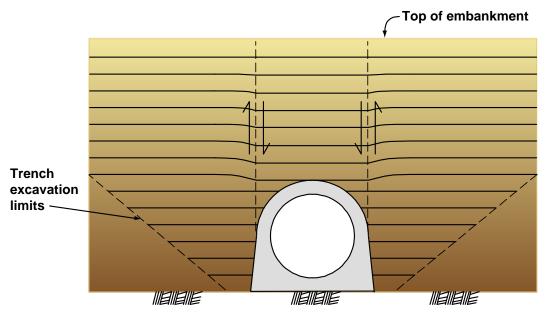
Conduit constructed within a trench excavated into the embankment. Friction factors decrease embankment load on the conduit as earthfill over conduit settles downward relative to adjacent embankment.
